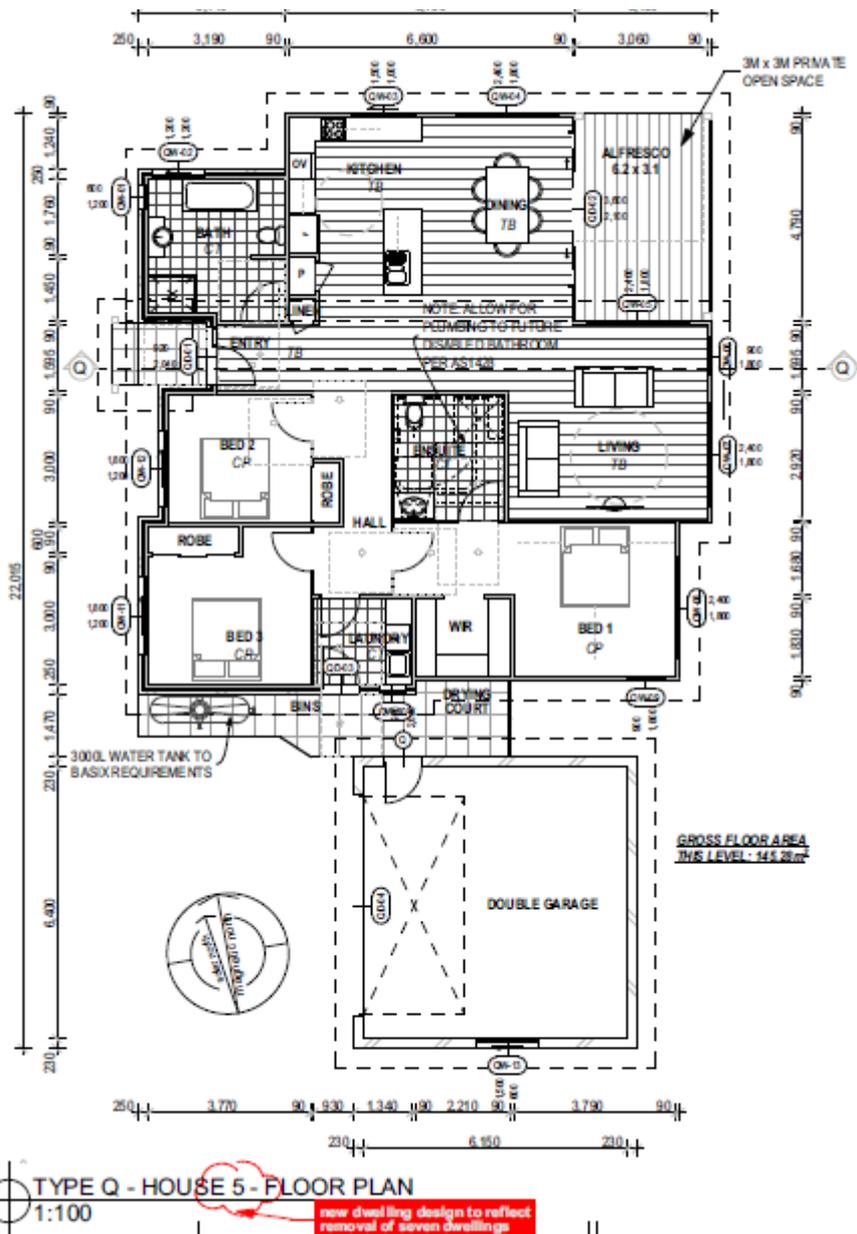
Proposed Housing Type Q Floor Plan (Dwelling 5)
